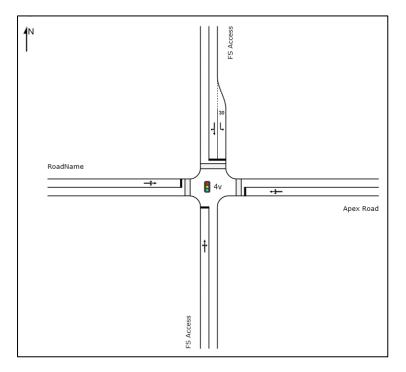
Intersection 4 Proposed Realigned Layout (2026 Background Traffic)
